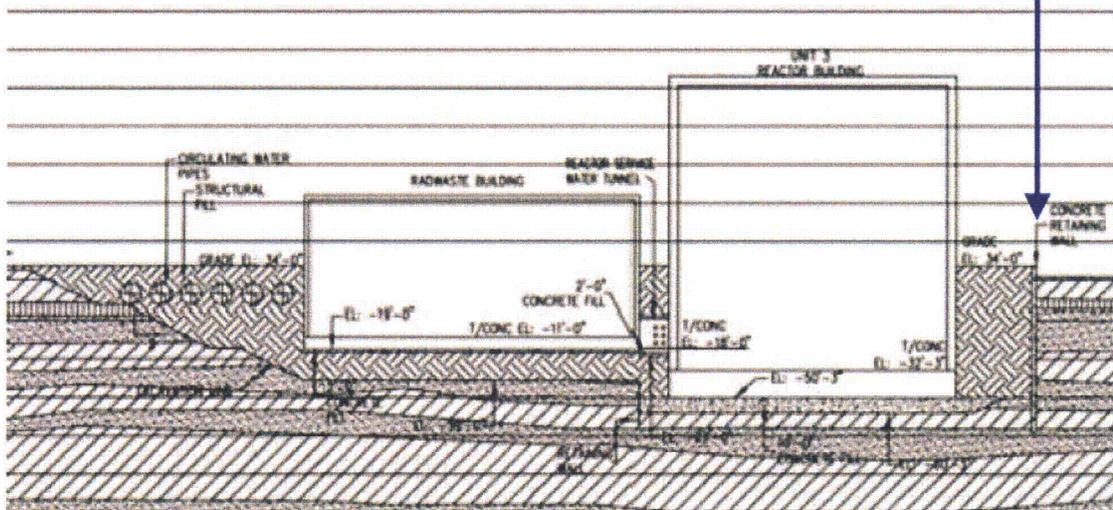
Reinforced Concrete Retaining Wall for Crane Foundation
